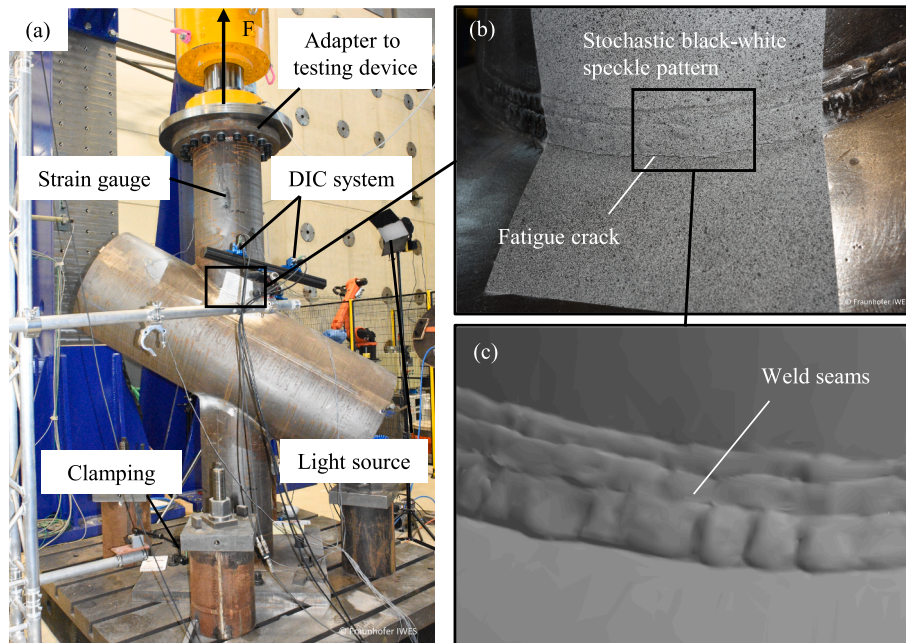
(a) Test setup for the axial fatigue tests of the tubular X-joints with Limess DIC system, (b) stochastic black-white speckle pattern for DIC measurement and (c) weld seam geometry extracted from scans.
